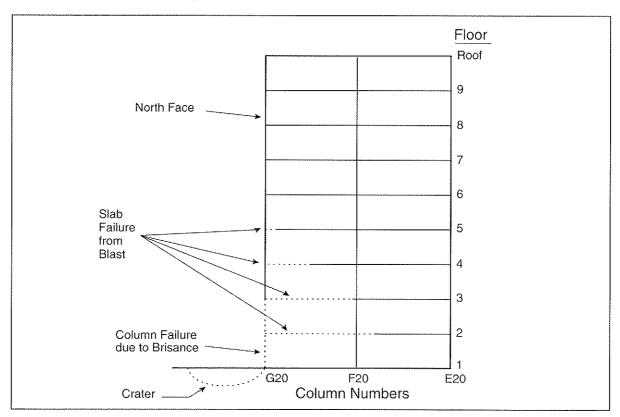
Cross section of nine-story portion of Murrah Building showing blast response of slabs.
